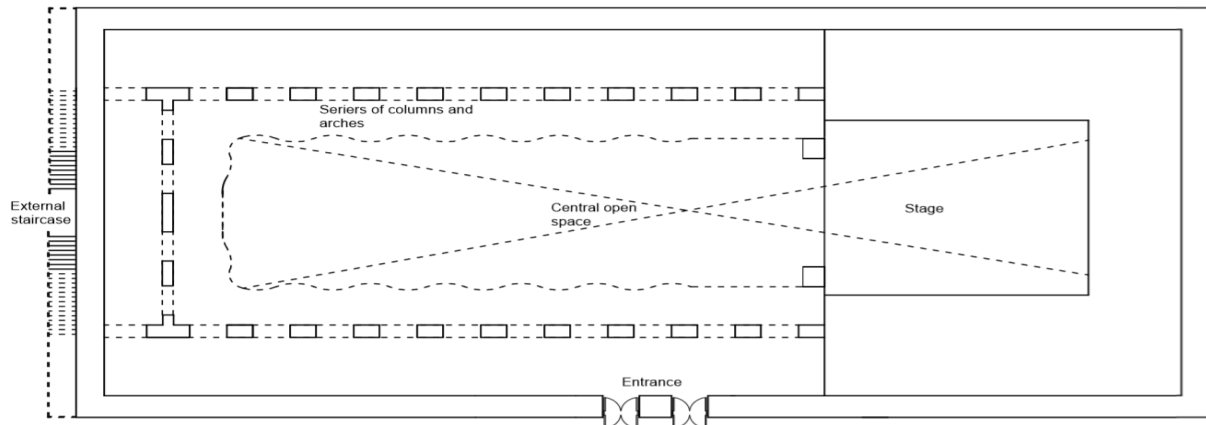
Ground floor plan of opera house before adaptive reuse -- Source: Author
